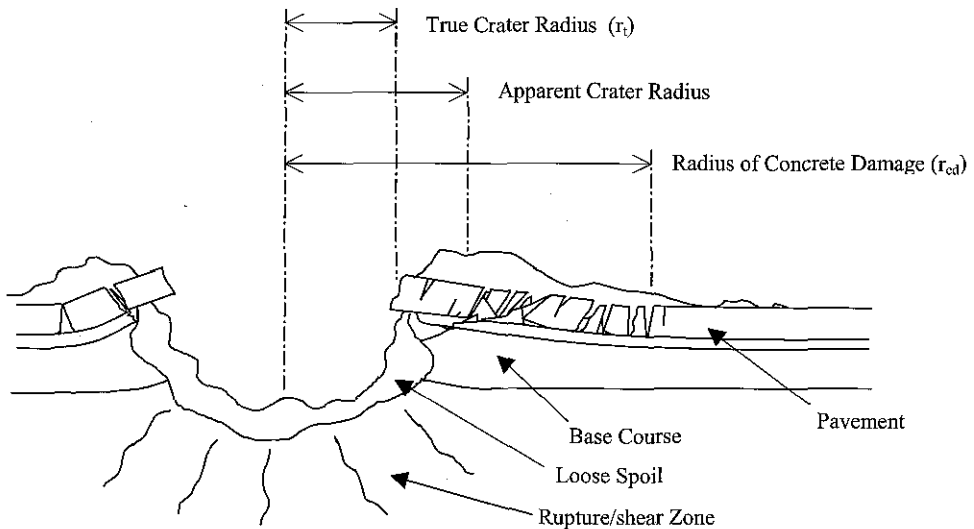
Damage Zones Resulting from Typical Crater in Concrete Runway
